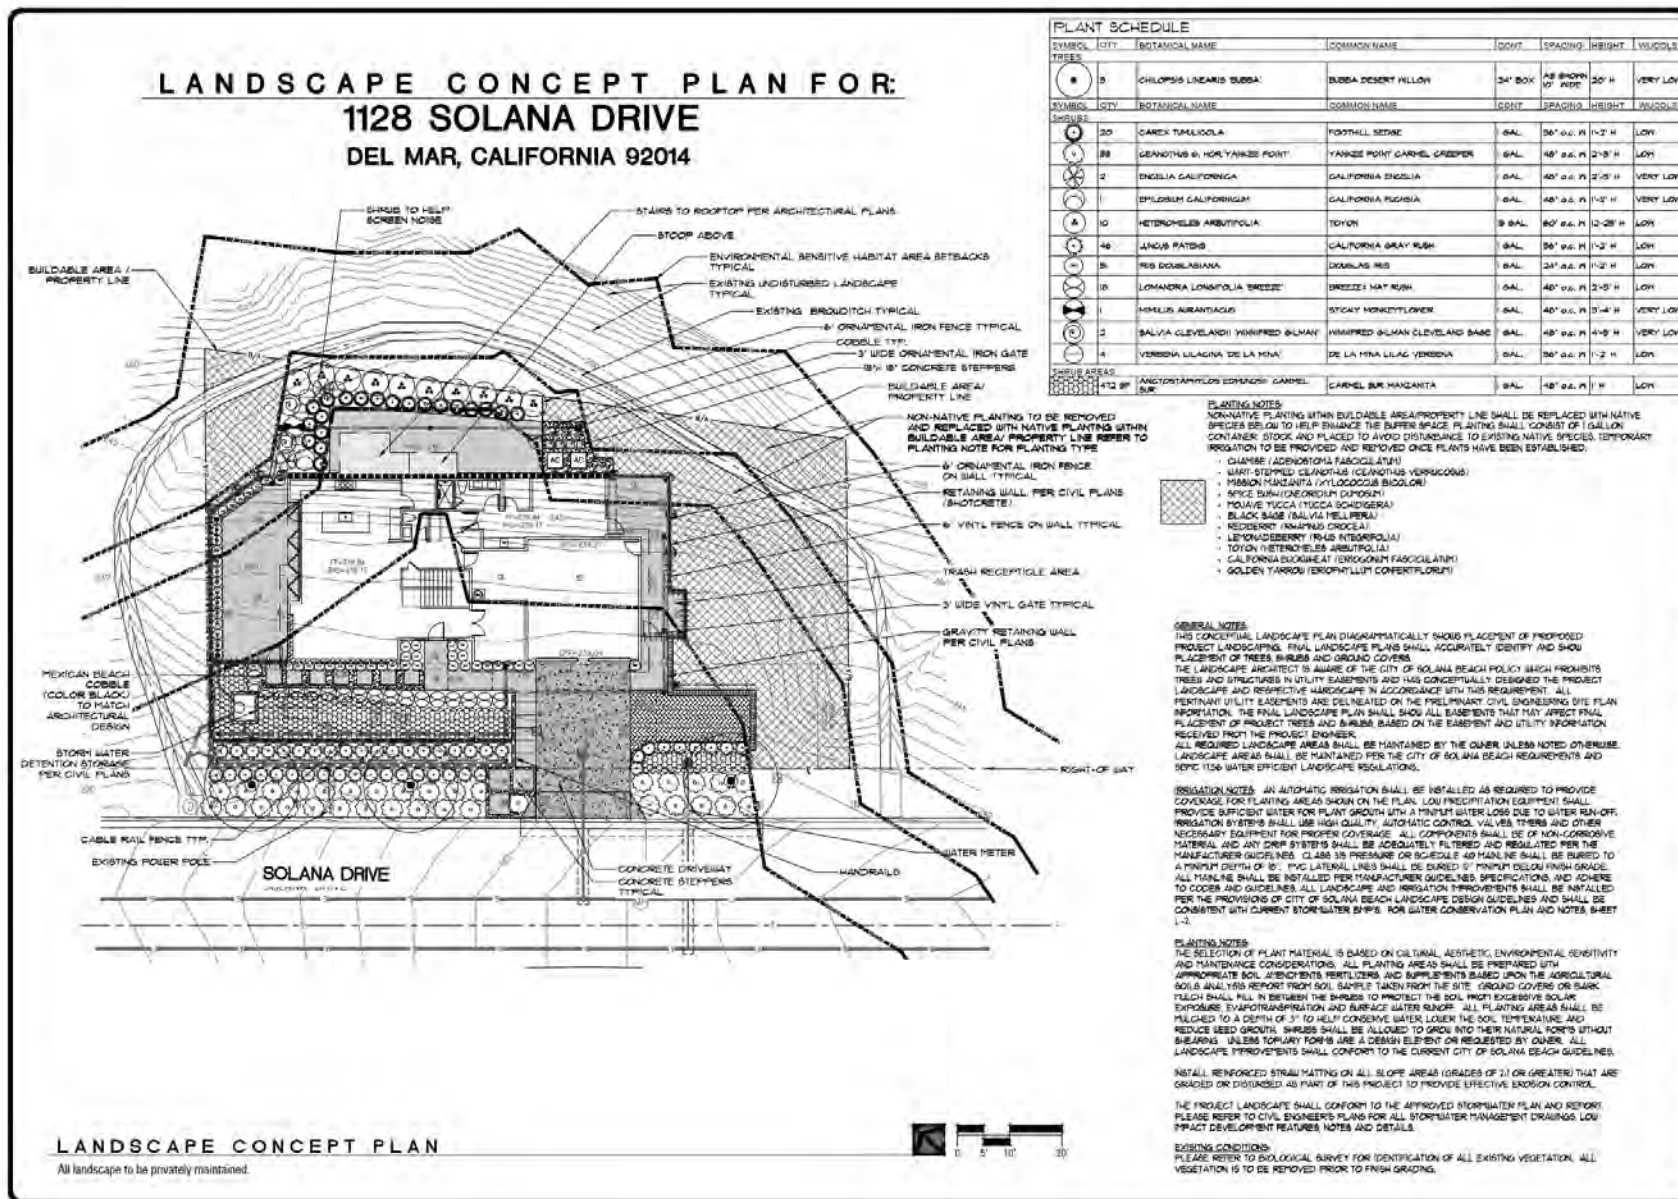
Landscape Plan for the Project Site, Sheet 1
